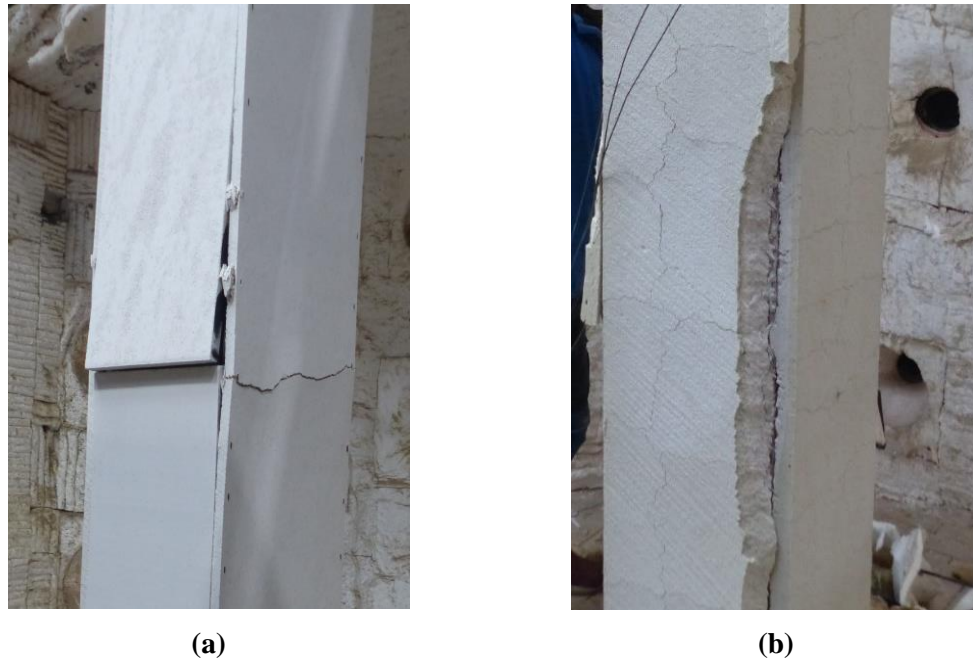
Test specimens and the damaged fire-protection layer after the fire test:
